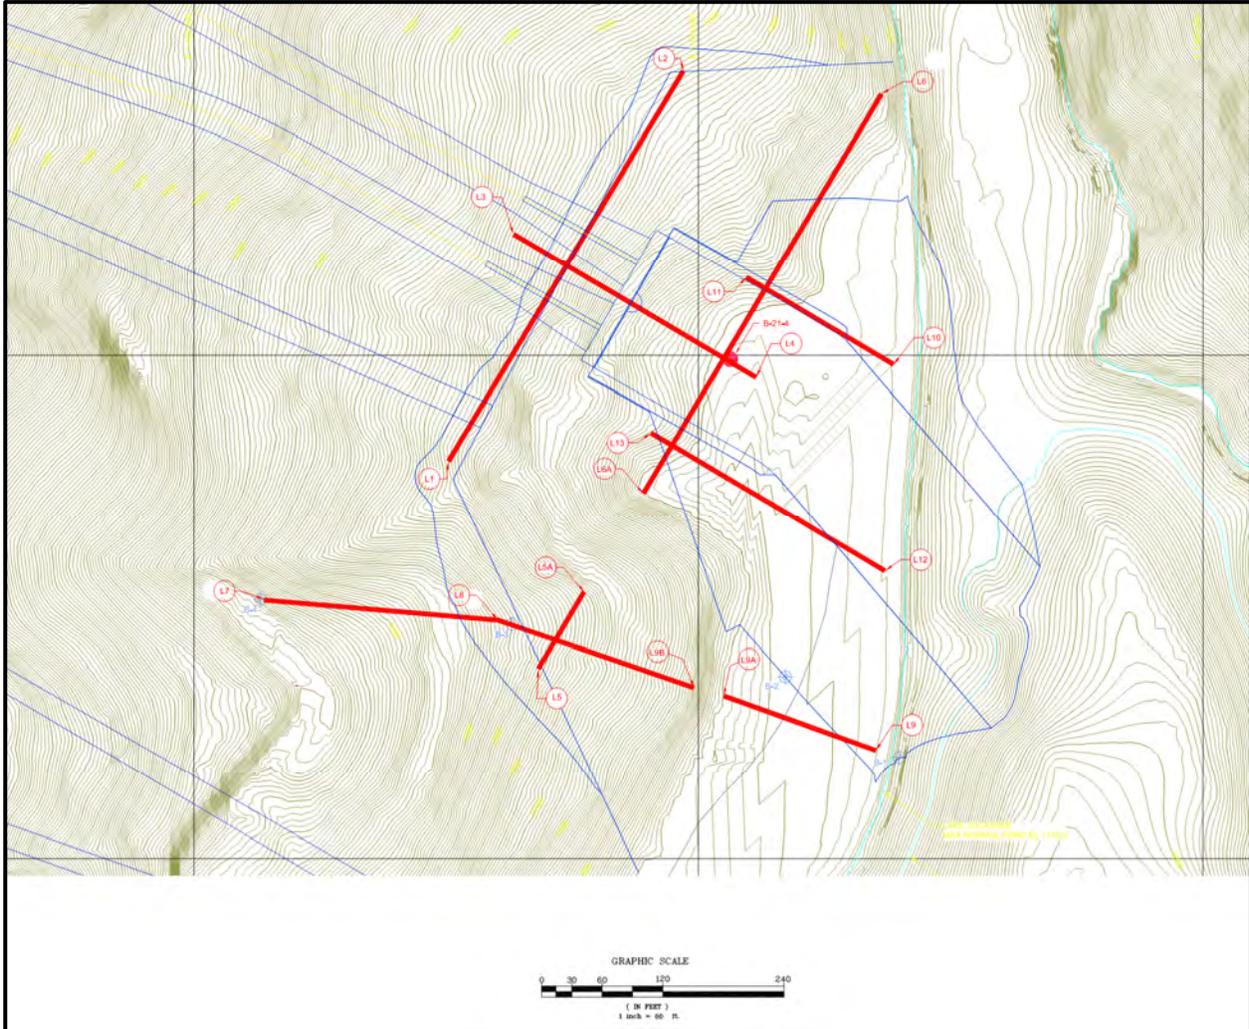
Profile lines at lower reservoir inlet/outlet works and main access tunnel.
